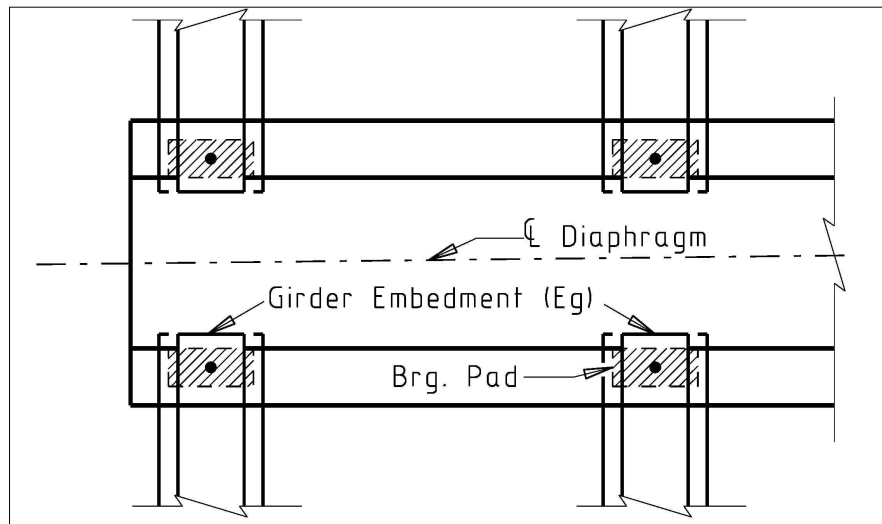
Beams Embedded Into the Diaphragm (Plan View)
